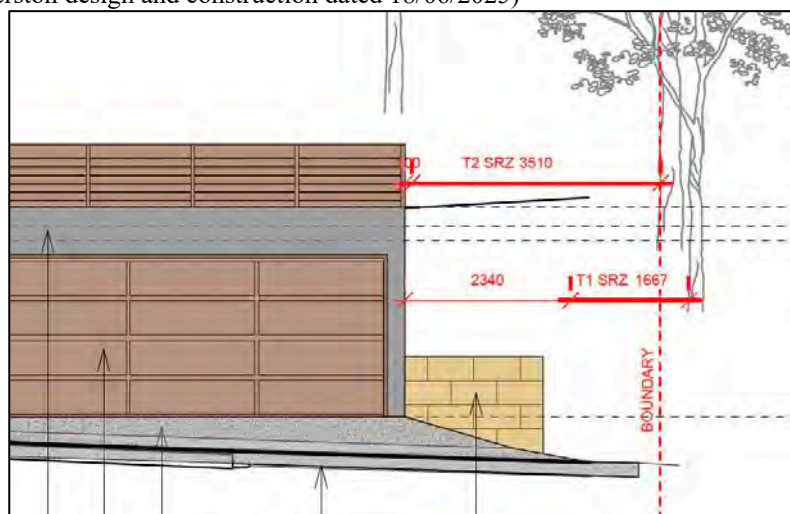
The SRZ for Tree 2 is not impact by the proposed excavation or construction works. The proposed retaining wall is also set outside the SRZ as seen above. (Source: Site Plans askerroberston design and construction dated 18/06/2025).
